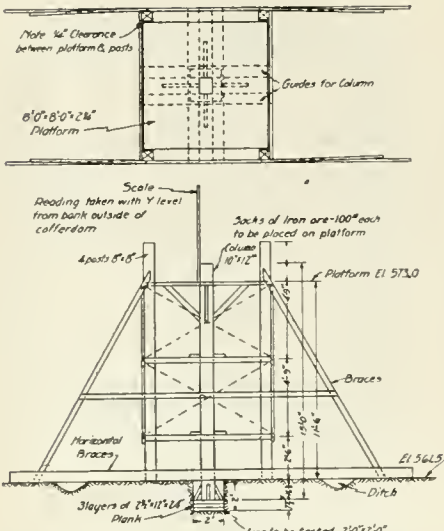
SHOWING LOADING PLATFORM FOR SOIL BEARING TESTS, WESTERLY SEWAGE TREATMENT WORKS, CLEVELAND, OHIO.
